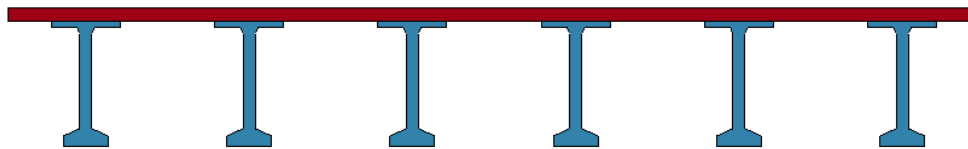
Cross-Sectional View of Archetype 4 Bridge Model
